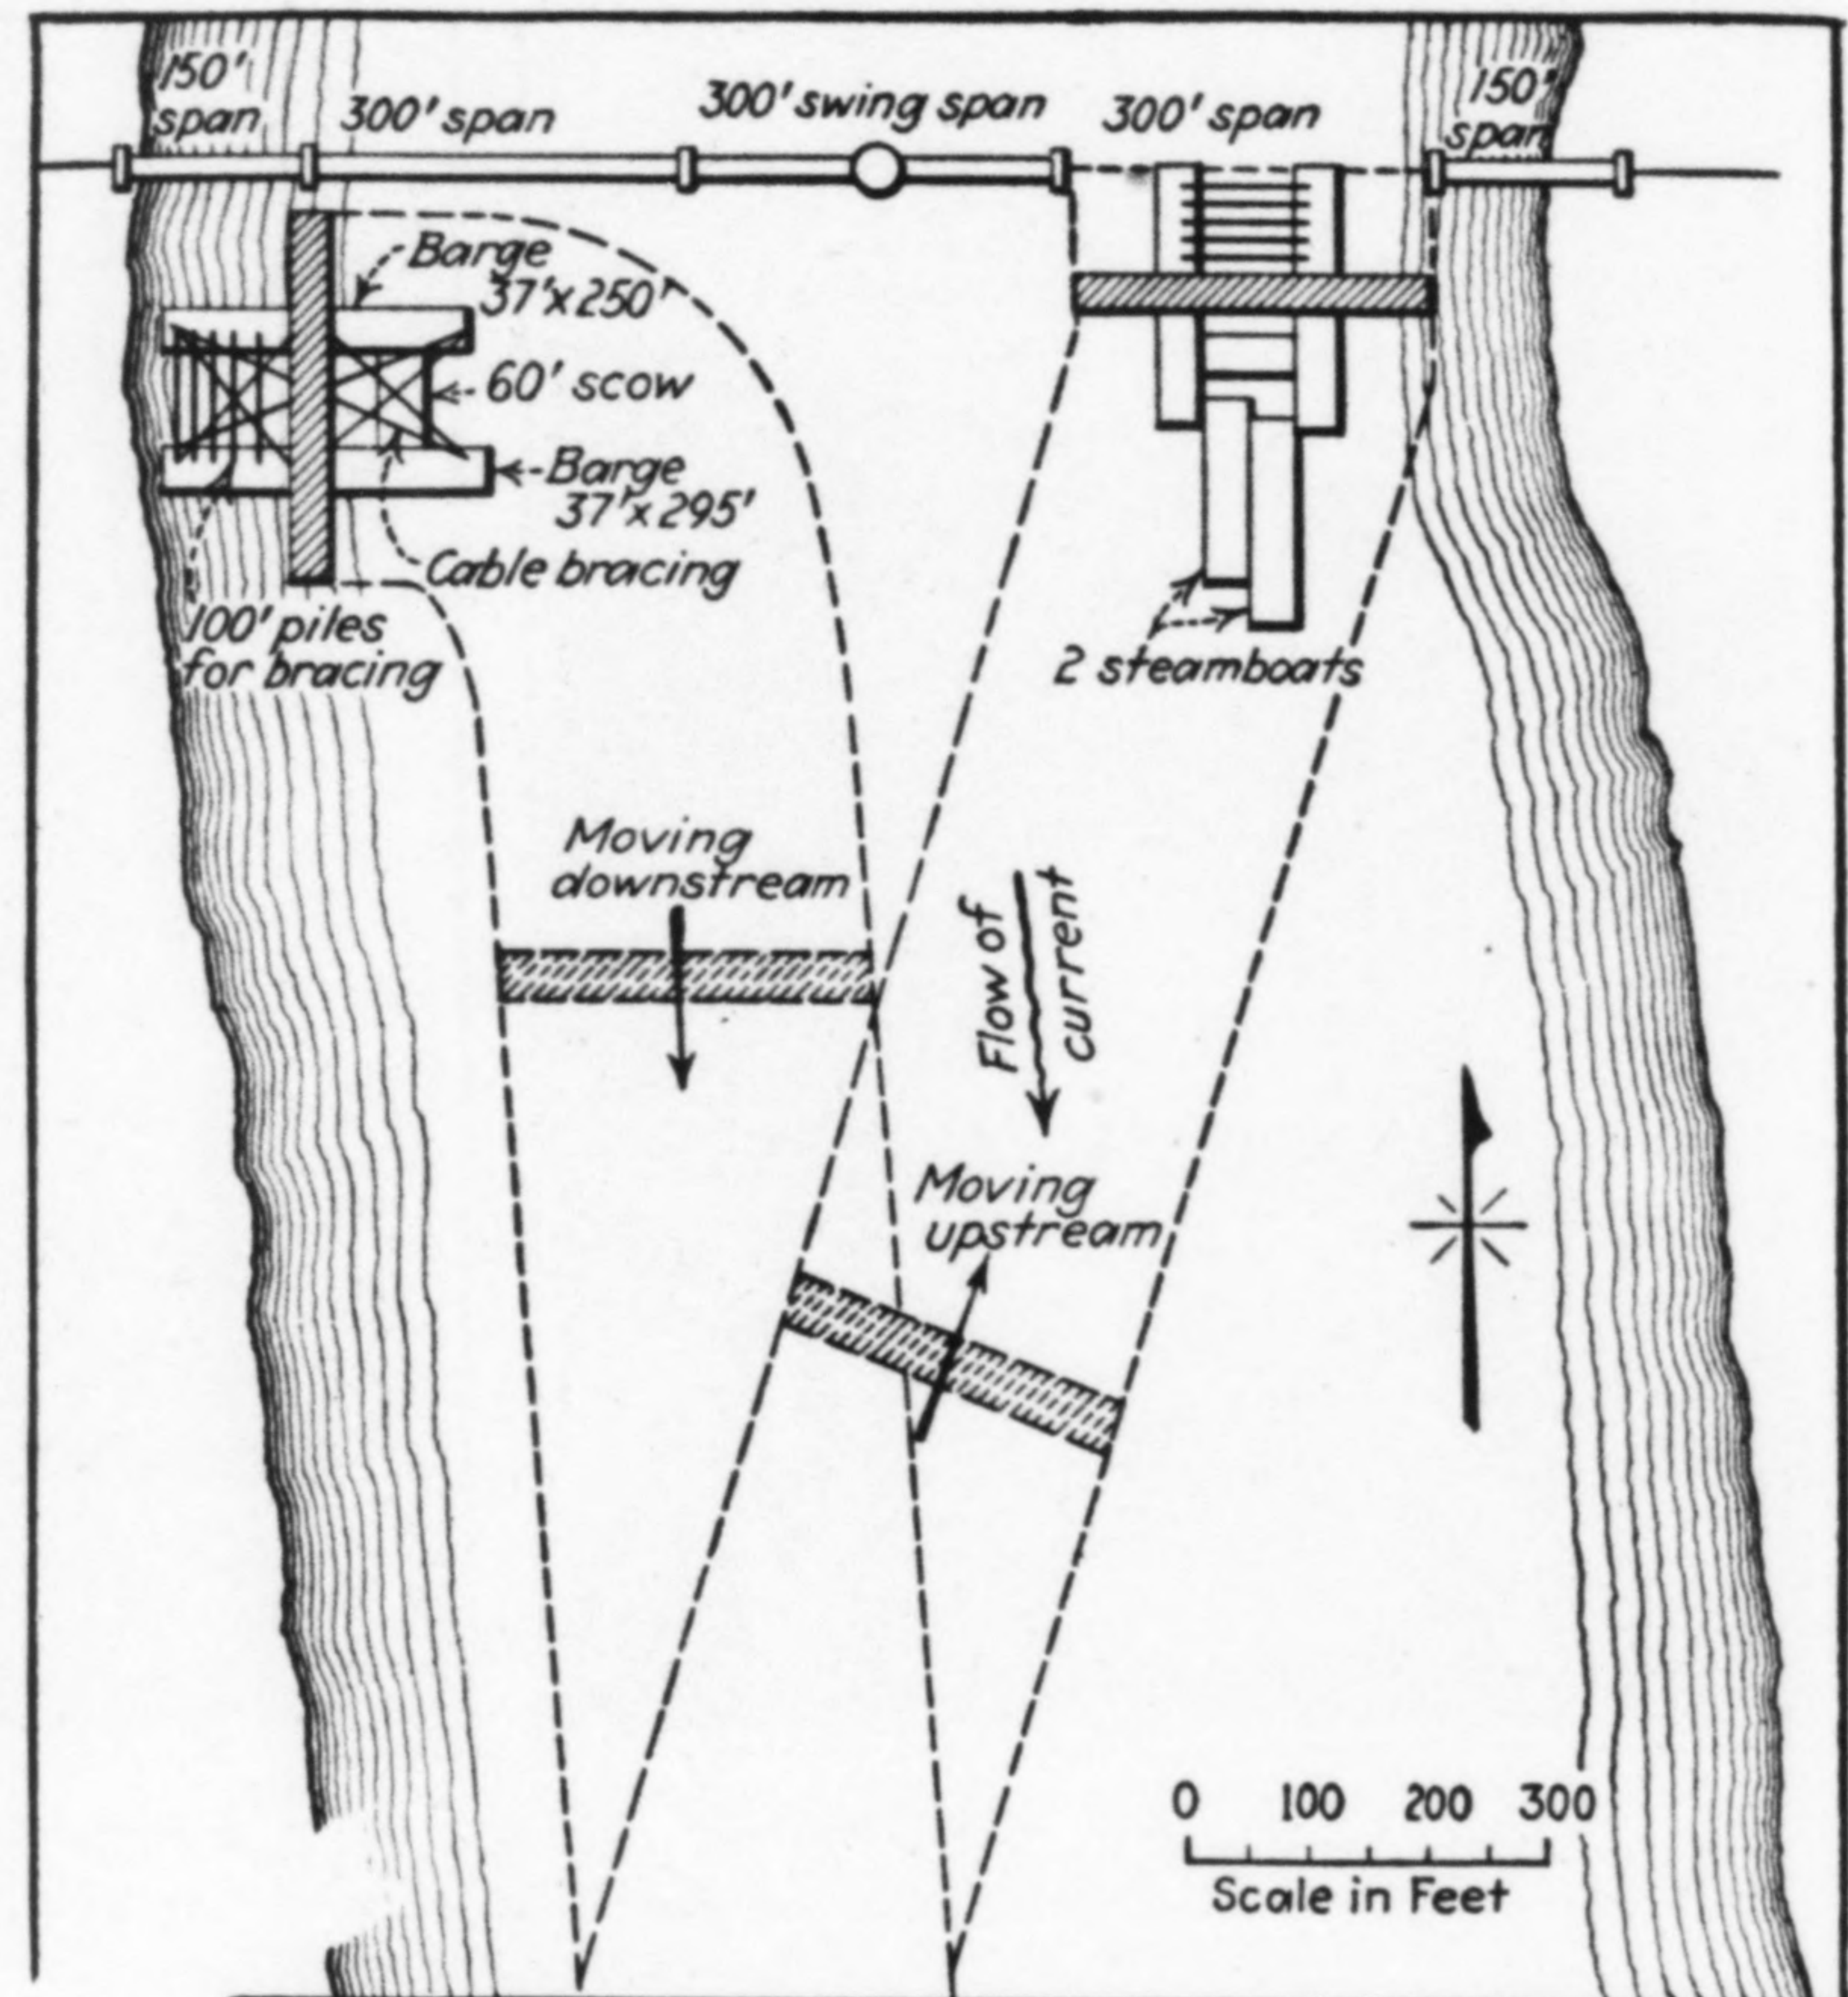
METHOD OF HANDLING FLOATING SPAN
